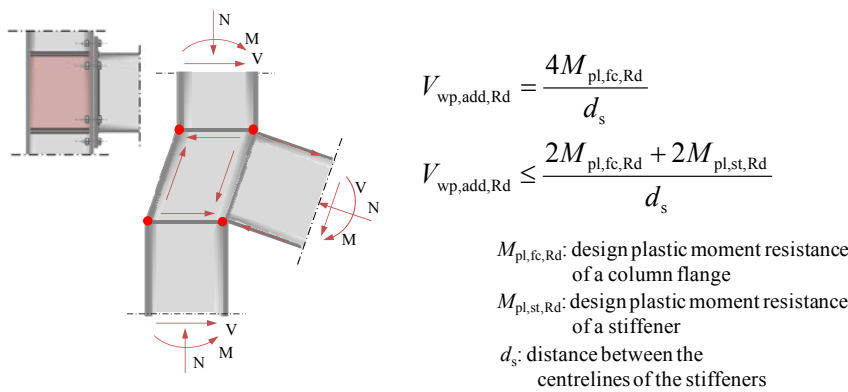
Additional resistance of the column web panel in shear for column web transverse stiffeners
